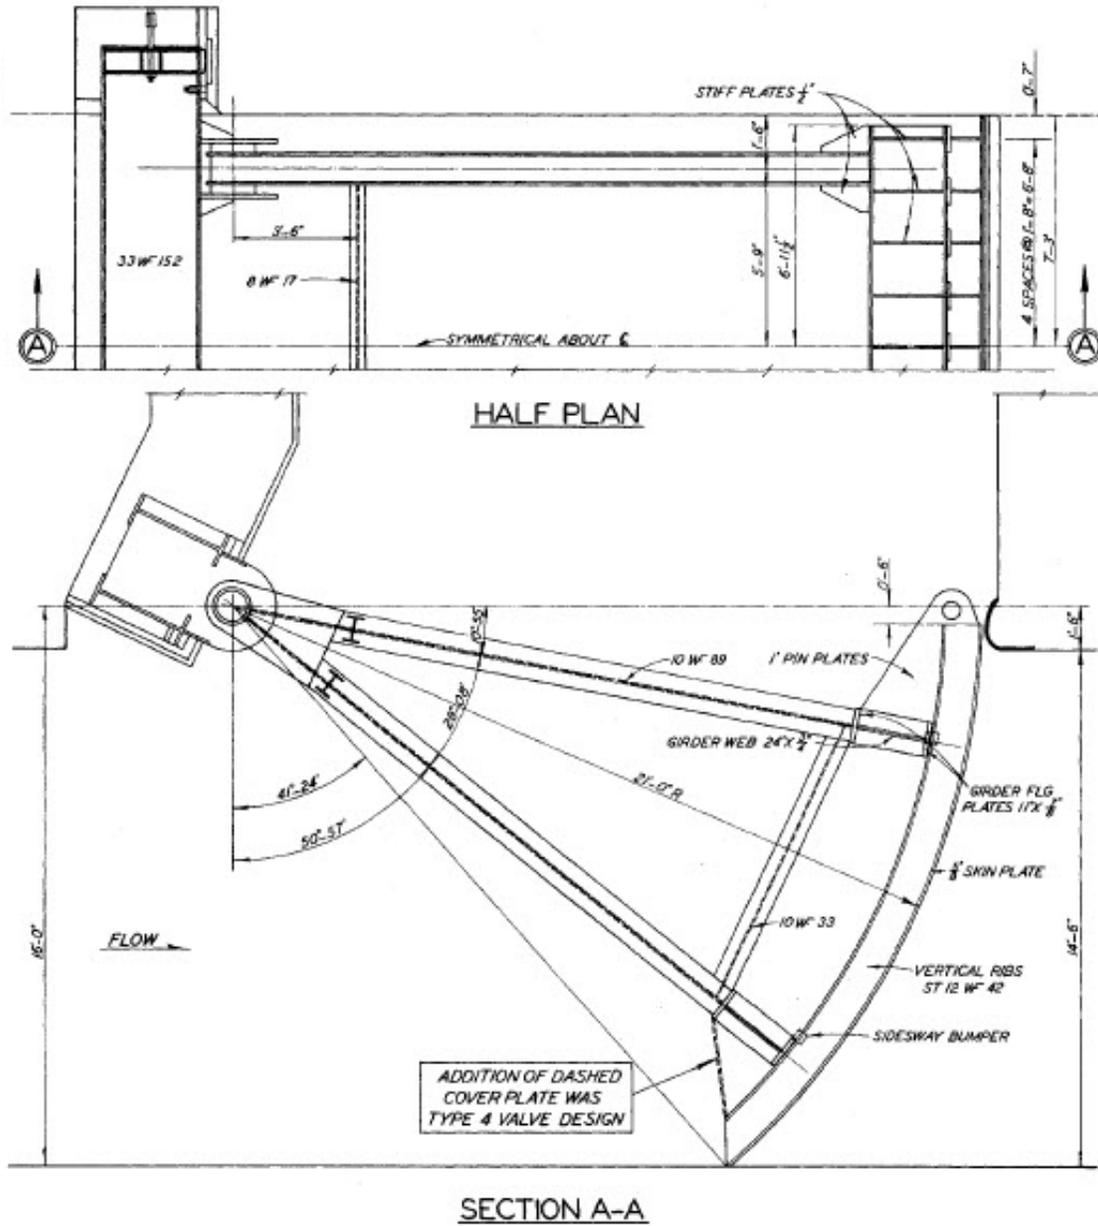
Tainter Valves, Poe Lock, Types 3 and 4 Designs.
